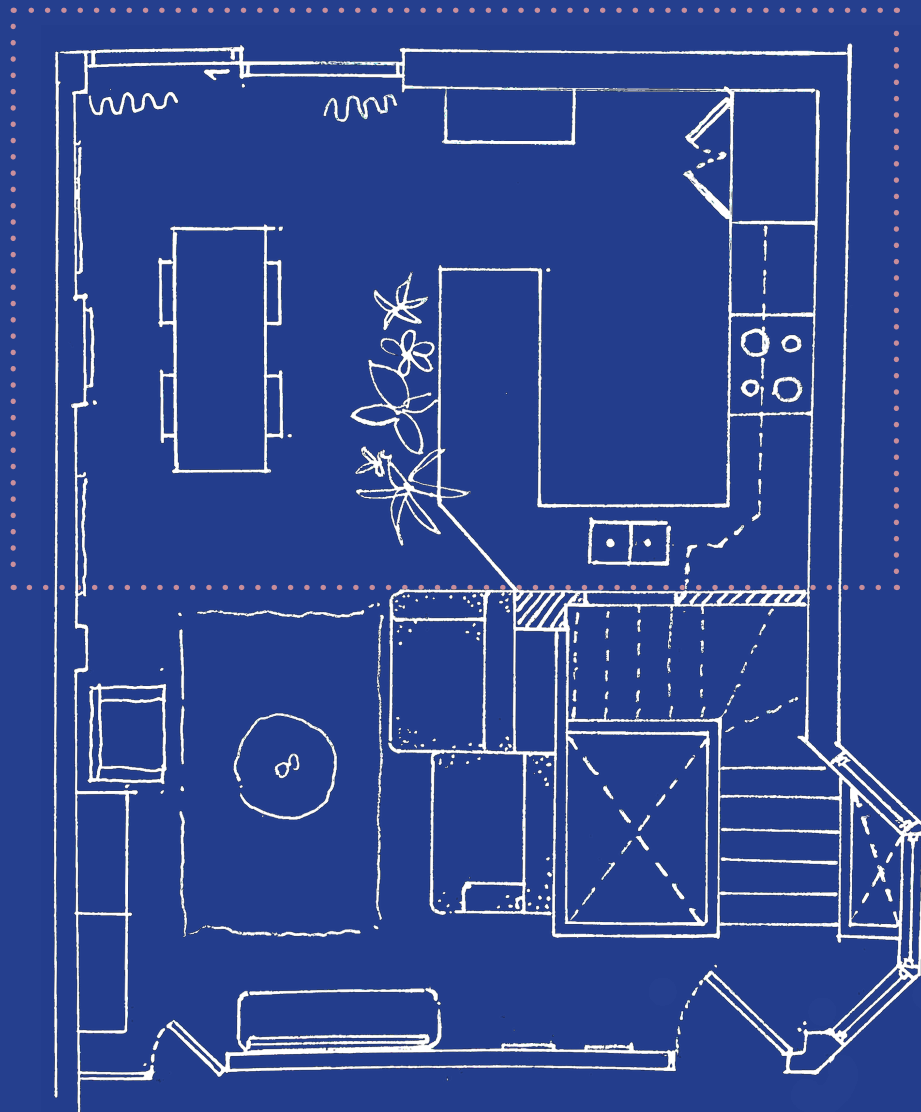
BY AUTHOR, ILLUSTRATION OF THE HOUSE FLOOR PLAN, 2024.
